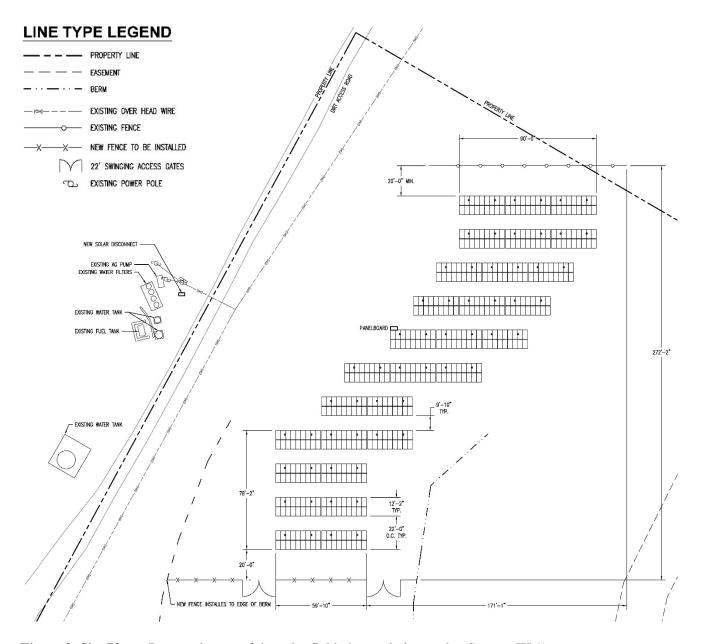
Site Plan – Proposed array of the solar field photovoltaic panels. (Source: IX.1)
